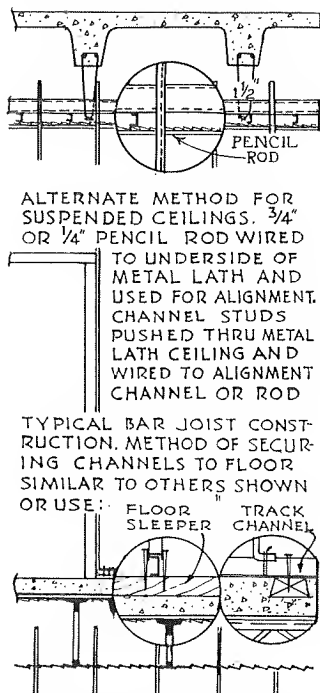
(ABOVE) Upper ends of studs pushed through holes in ceiling lath and tied to alignment channel.
